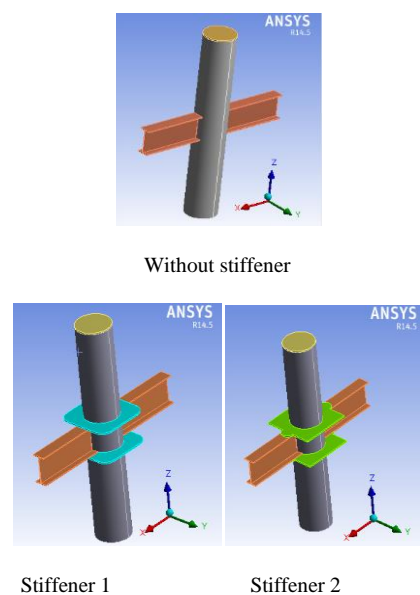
Beam – Circular column connections with different Stiffener Configurations
